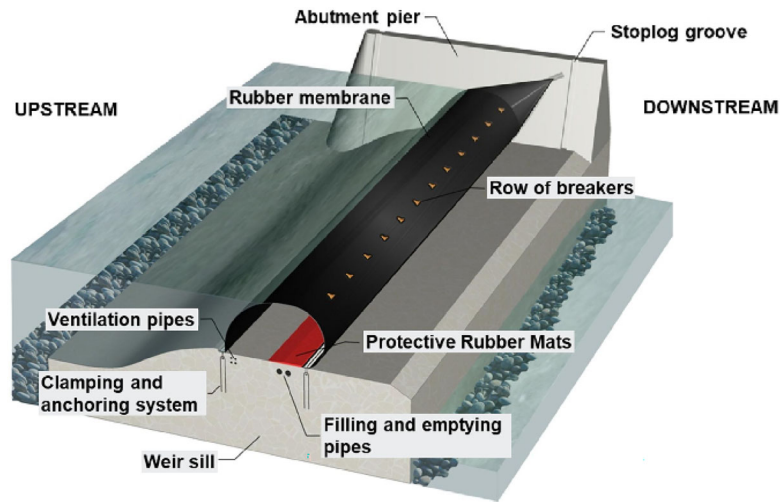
Rubber dam. General construction. For details see Gebhardt et al.⁹⁰
